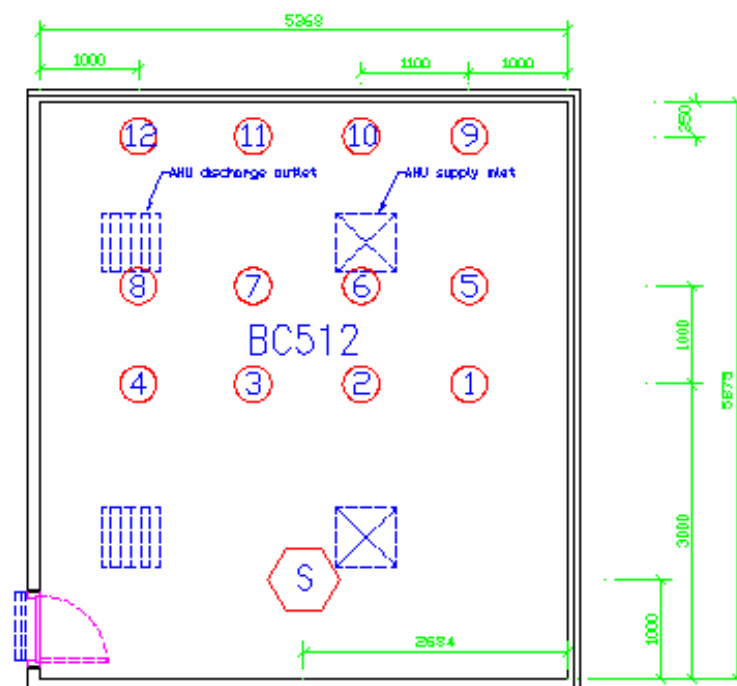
Plan layout of the acoustic measurement in classroom BC512.
